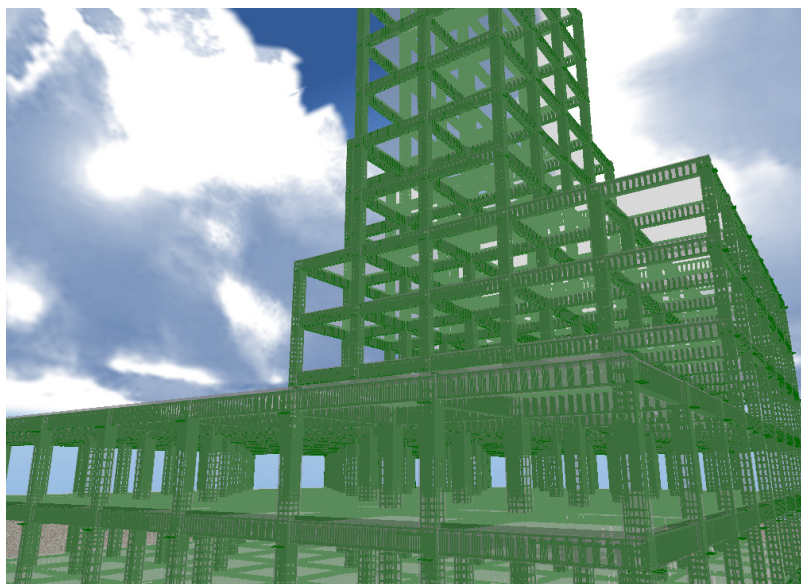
Rendered 3D perspective of the structure with all reinforcement details, as shown in AMS
